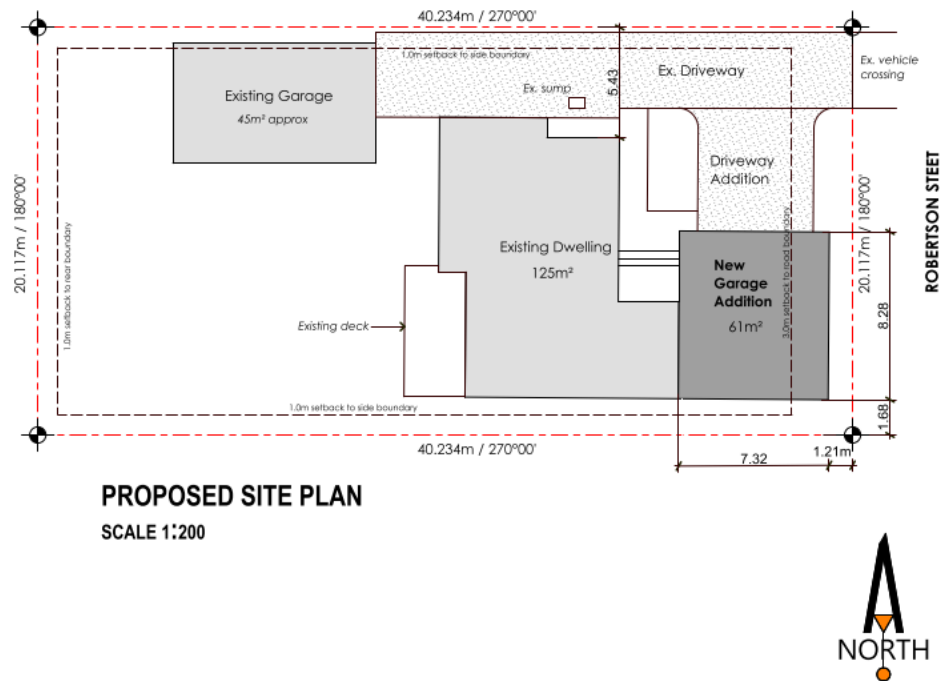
Location of proposed garage (Source: Applicant's architectural plan)
